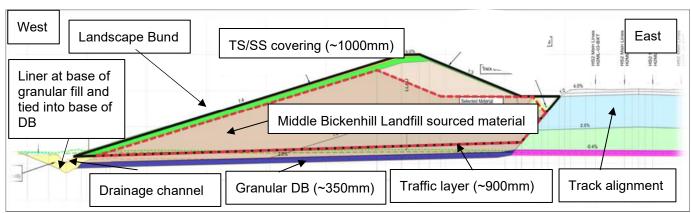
Cross section of Pool Wood Embankment showing main design elements of the site
